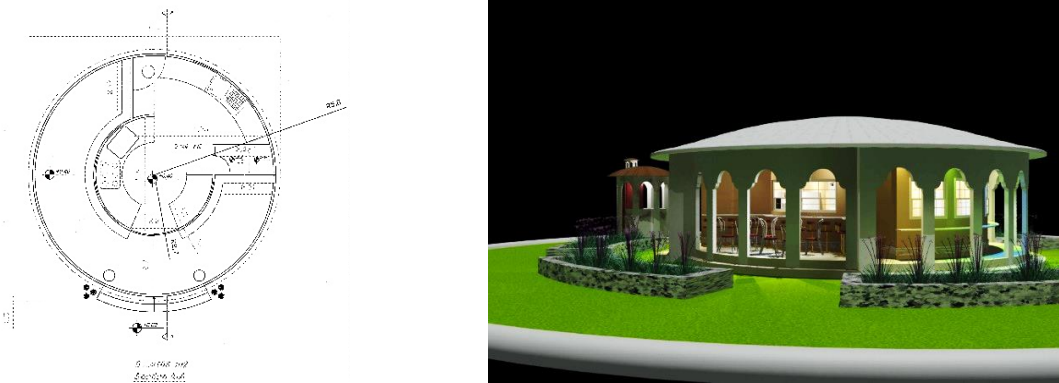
Architectural plan and perspective view of the designed building, Azad University, Damghan campus
